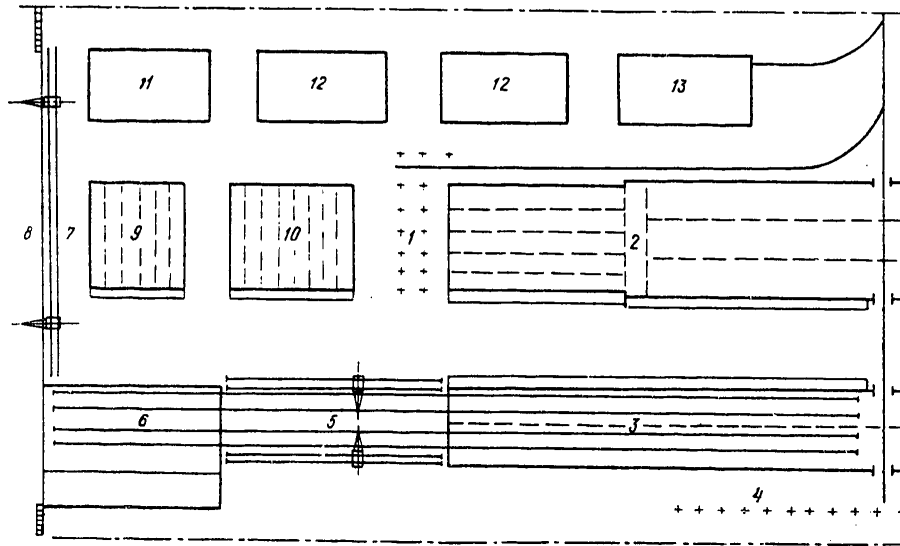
Master plan layout of the main facilities of a Class II shipyard with horizontal building berths. 1--steel storage area; 2--hull shop module (hull platers, assembly-welding, structural elements made of aluminum-magnesium alloys); 3--covered slipway (shop for assembly of modules and shipbuilding shed); 4--section storage; 5--uncovered shipbuilding ways; 6--wet dock; 7--outfitting quay; 8--water area; 9--outfitting shop module (outfitting-acceptance and electrical wiring shops, contractors, electrical equipment storage, shop for structural elements made of synthetic materials); 10-- makeup shop module (hull fitting, pipe preparation, galvanizing; central makeup storage); 11--woodworking shop with storage areas, dryers and impregnating unit; 12--mechanical and auxiliary shop module; 13--storage area module.
